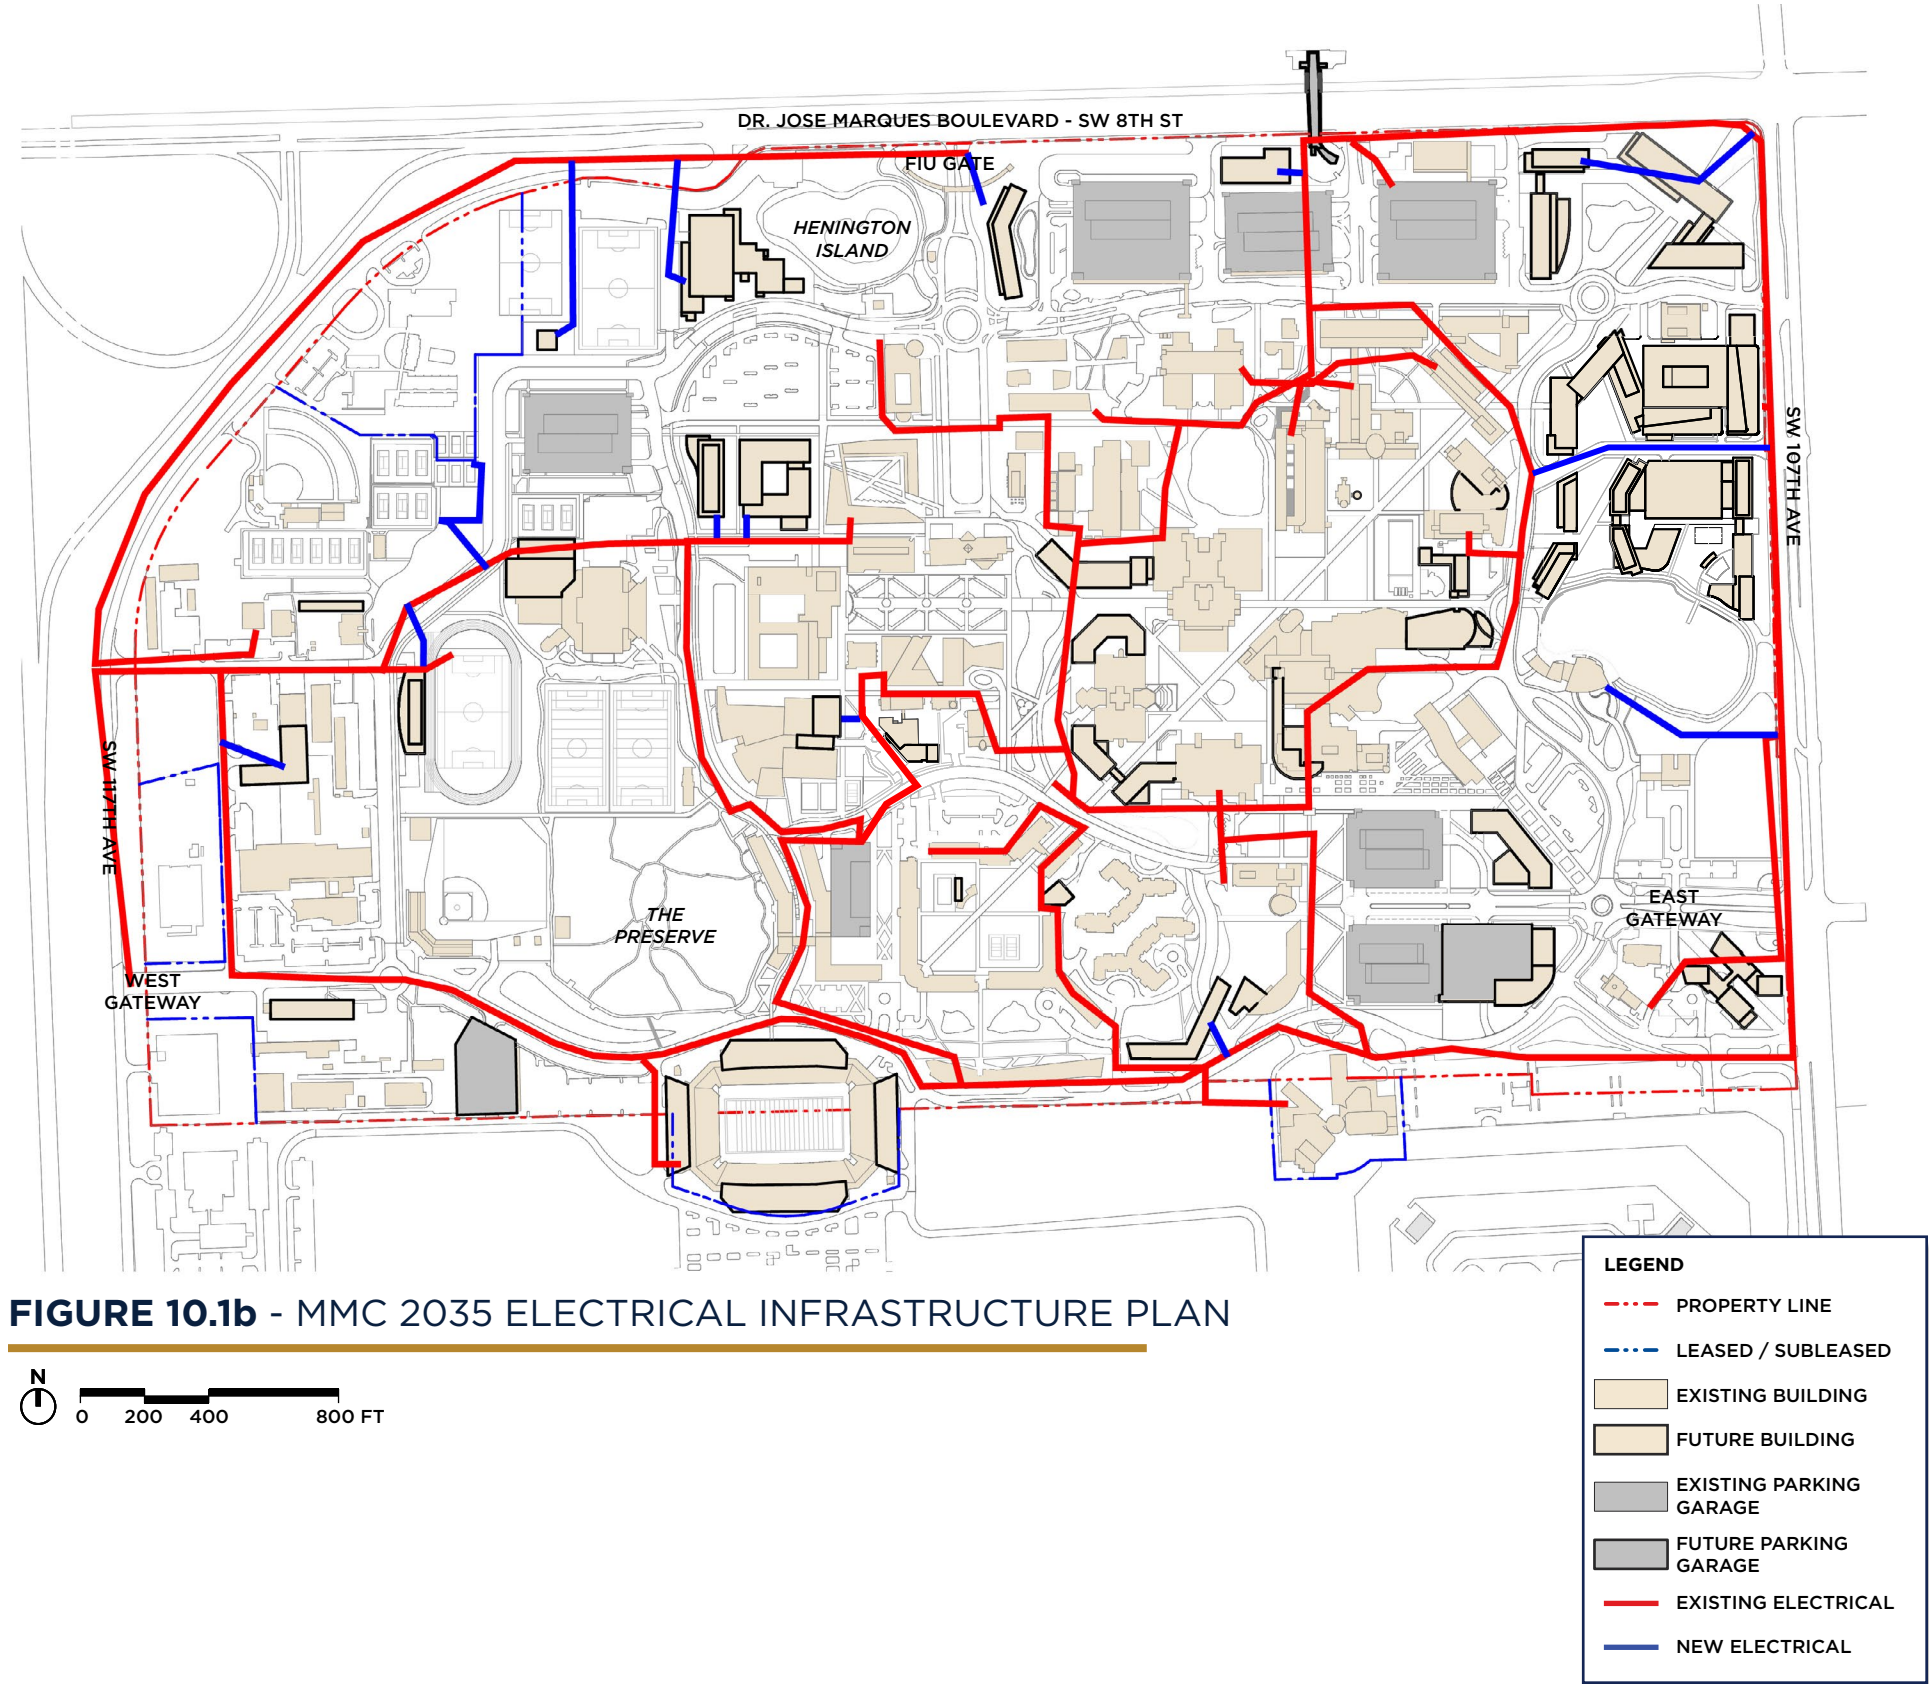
MMC 2035 ELECTRICAL INFRASTRUCTURE PLAN
